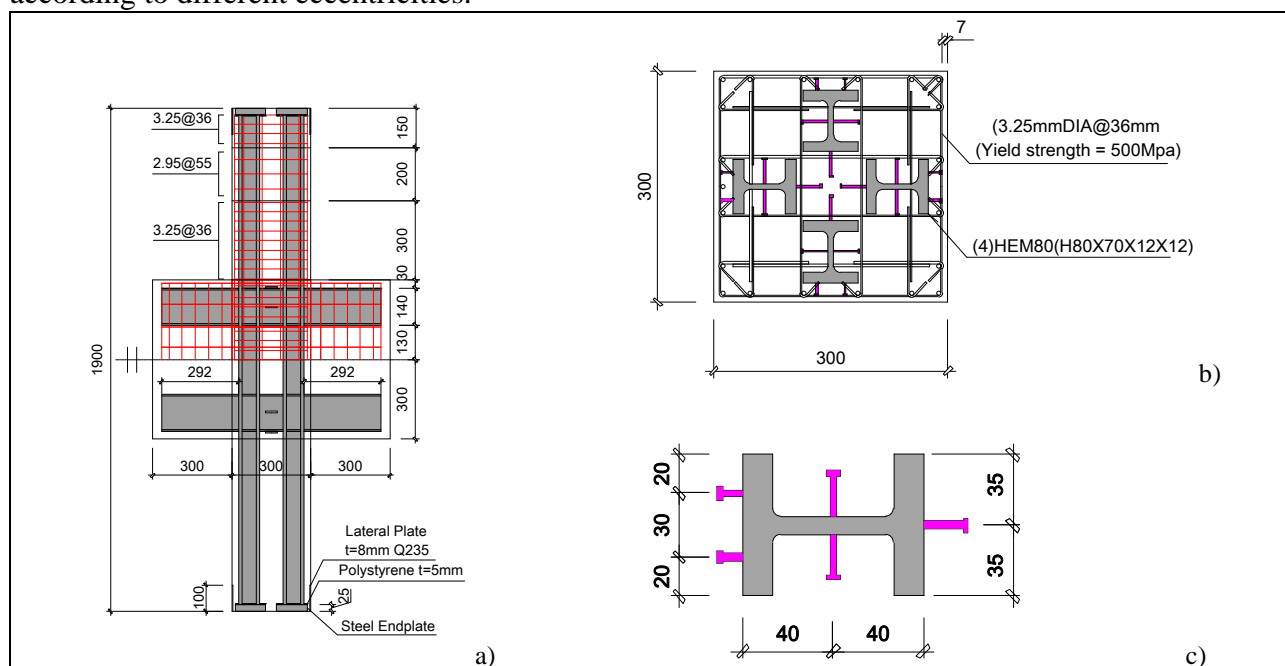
Phase 2: Quasi-static tests: a) steel layout – longitudinal; b) steel layout – cross section; c) shear studs layout.
